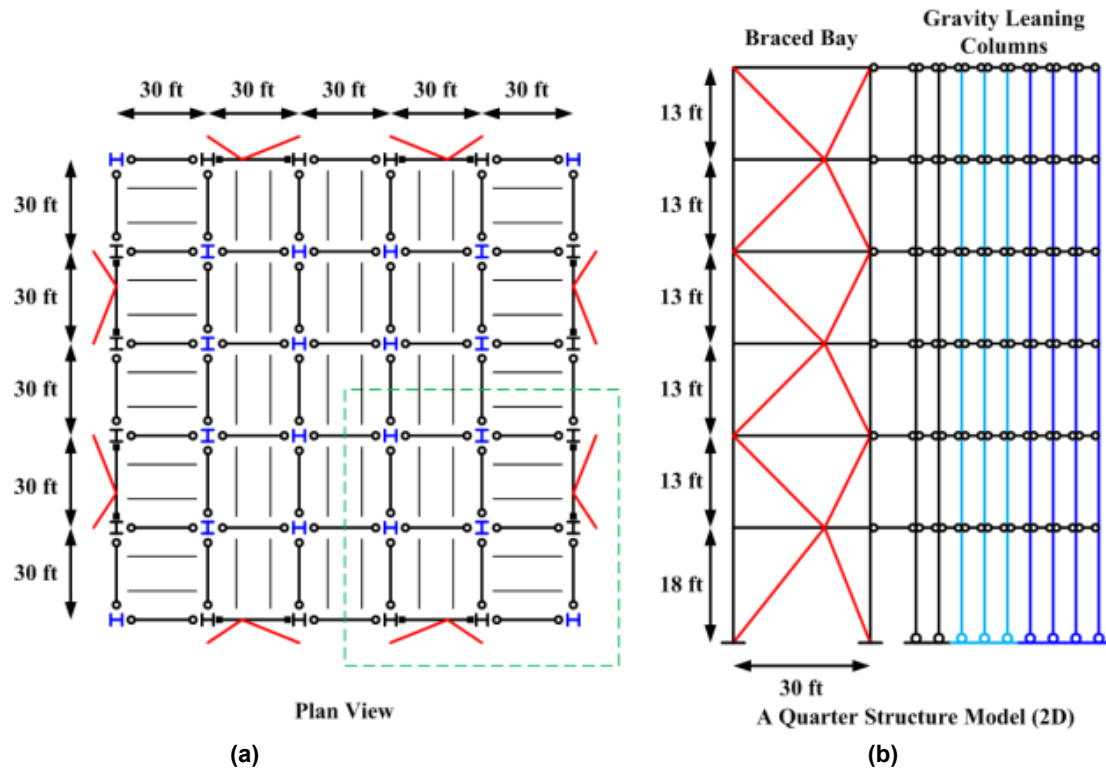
Plan view of the example building and the two-dimensional model elevation.
